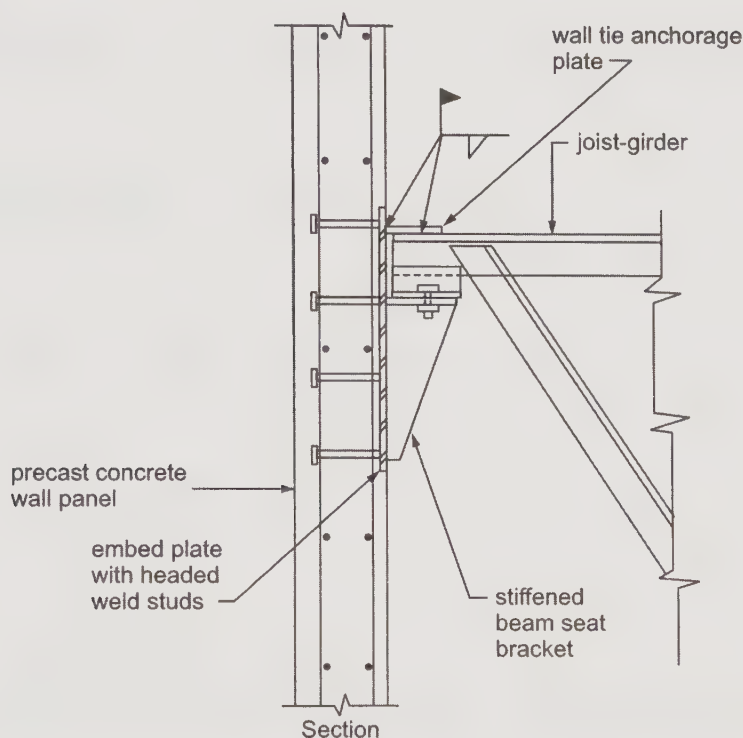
Bracket for wall-roof anchorage at joist-girder
